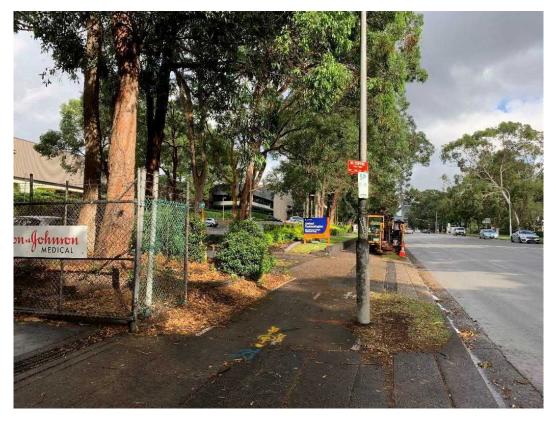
Looking west from the proposed Road 22 at the existing shared path on the southern side of Talavera Road
